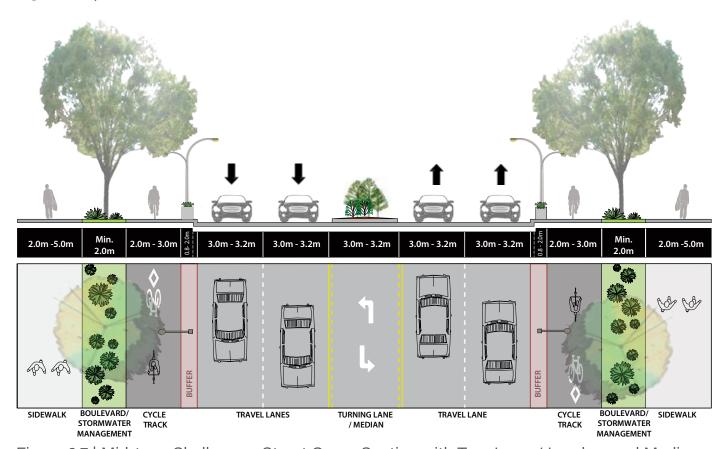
| Mid-term Shelbourne Street Cross-Section with Turn Lane / Landscaped Median
